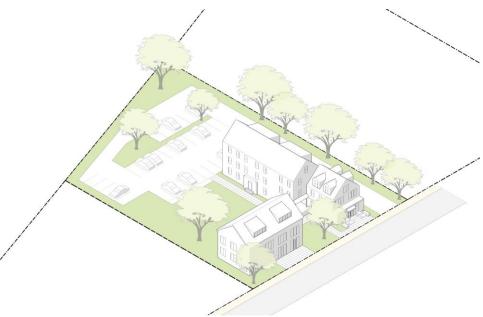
Willow Street Mixed-Use Sub-District Vision Illustration
